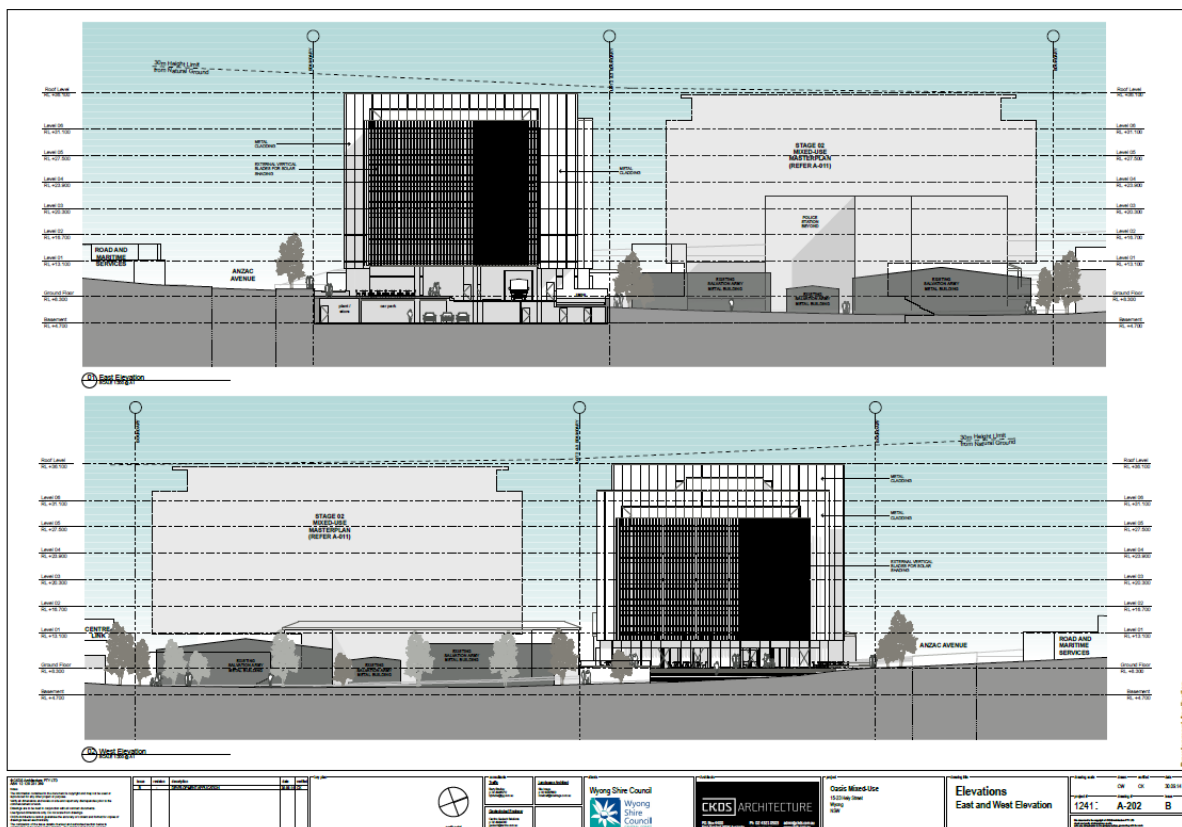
East and west elevations of proposed Stage 1 mixed use commercial and retail development.
